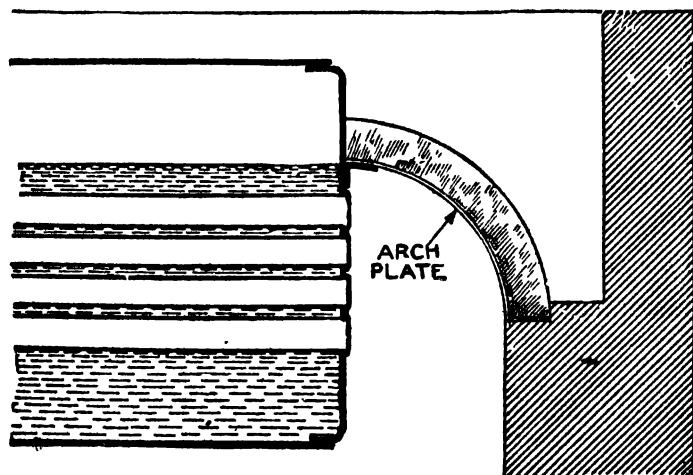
,396.—Ordinary arch back connection with inside cast iron arch plate. The objection to this construction is that the cast iron plate is exposed to the intense heat.
